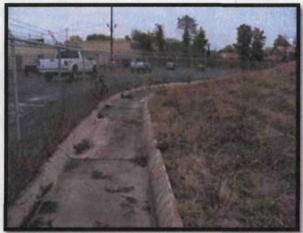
Concrete drainage swale, northwestern side of Taracorp pile (view northeast).
